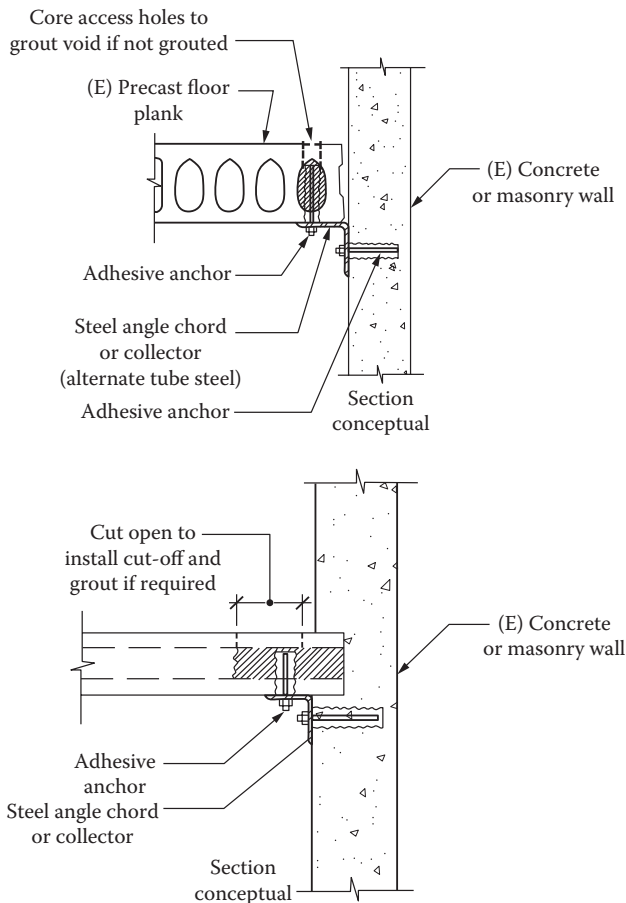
Steel chord or collector at floor perimeter without cast-in-place topping.
